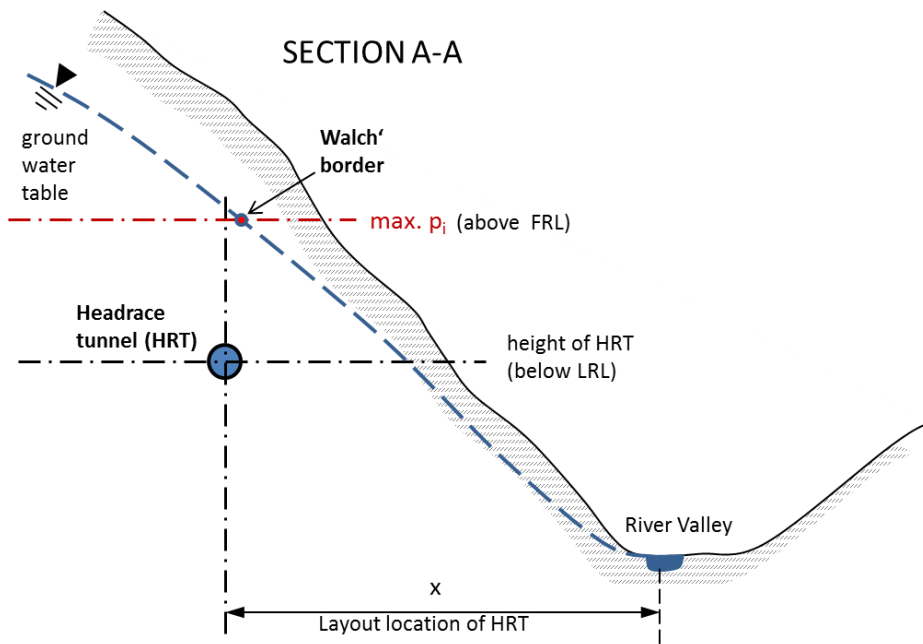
Cross section to place the headrace tunnel behind the Walch' border [1]
